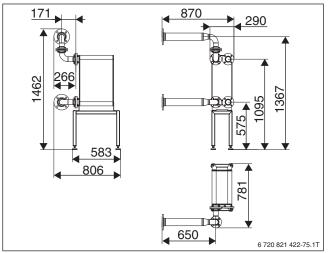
Heat exchanger assembly for 2-boiler cascade 2 × 300 kW
